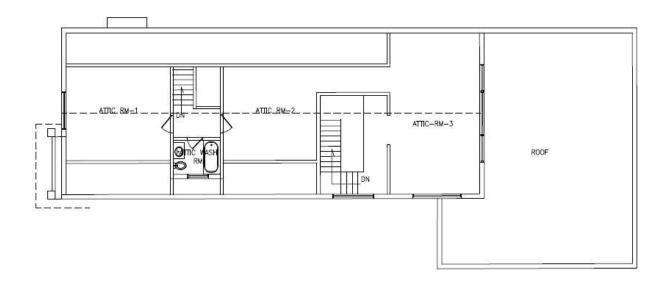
The upper or attic level, 347 Queen Street South. (Drawing by client, Jan. 2021.)
